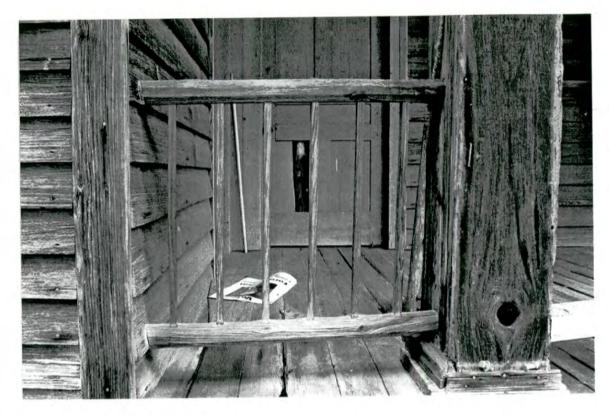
Calvin C. Gore House detail of front porch of house looking east, principal front entry in background
